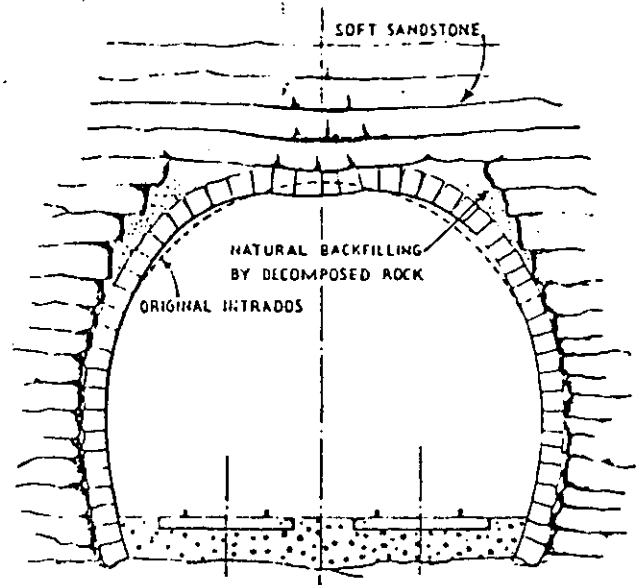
Deformation of a malconstructed tunnel arch by loosening pressure
